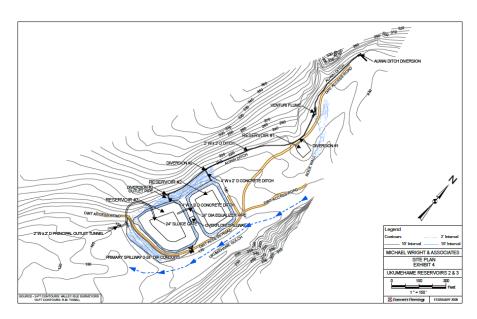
Plot plan. Source: Gannett Fleming Condition Assessment Report, April 2009.
